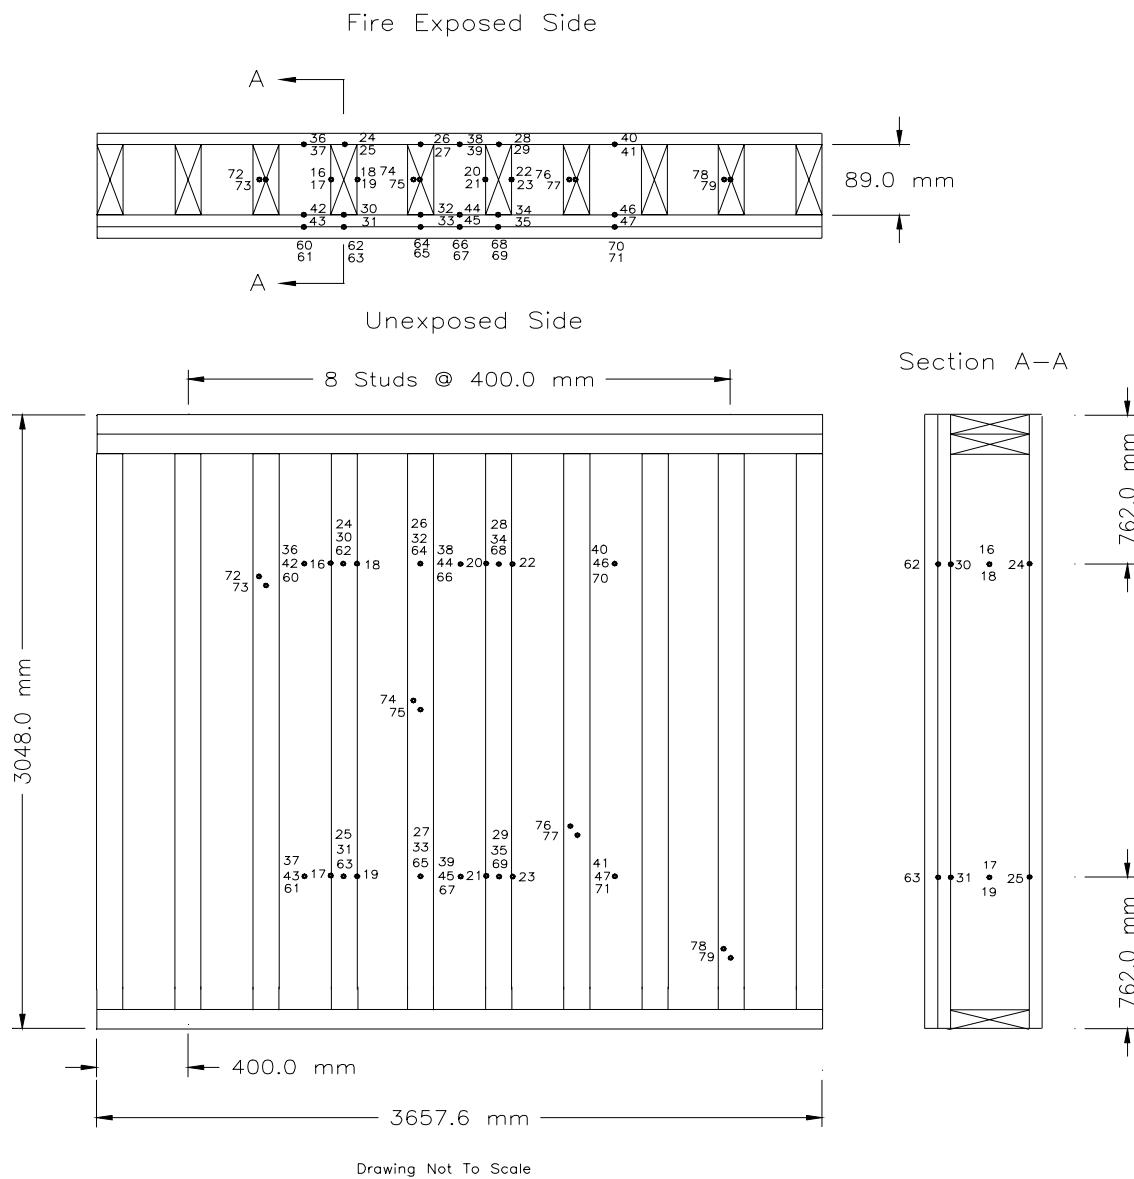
Thermocouple Locations in Wood Stud Wall Assemblies
